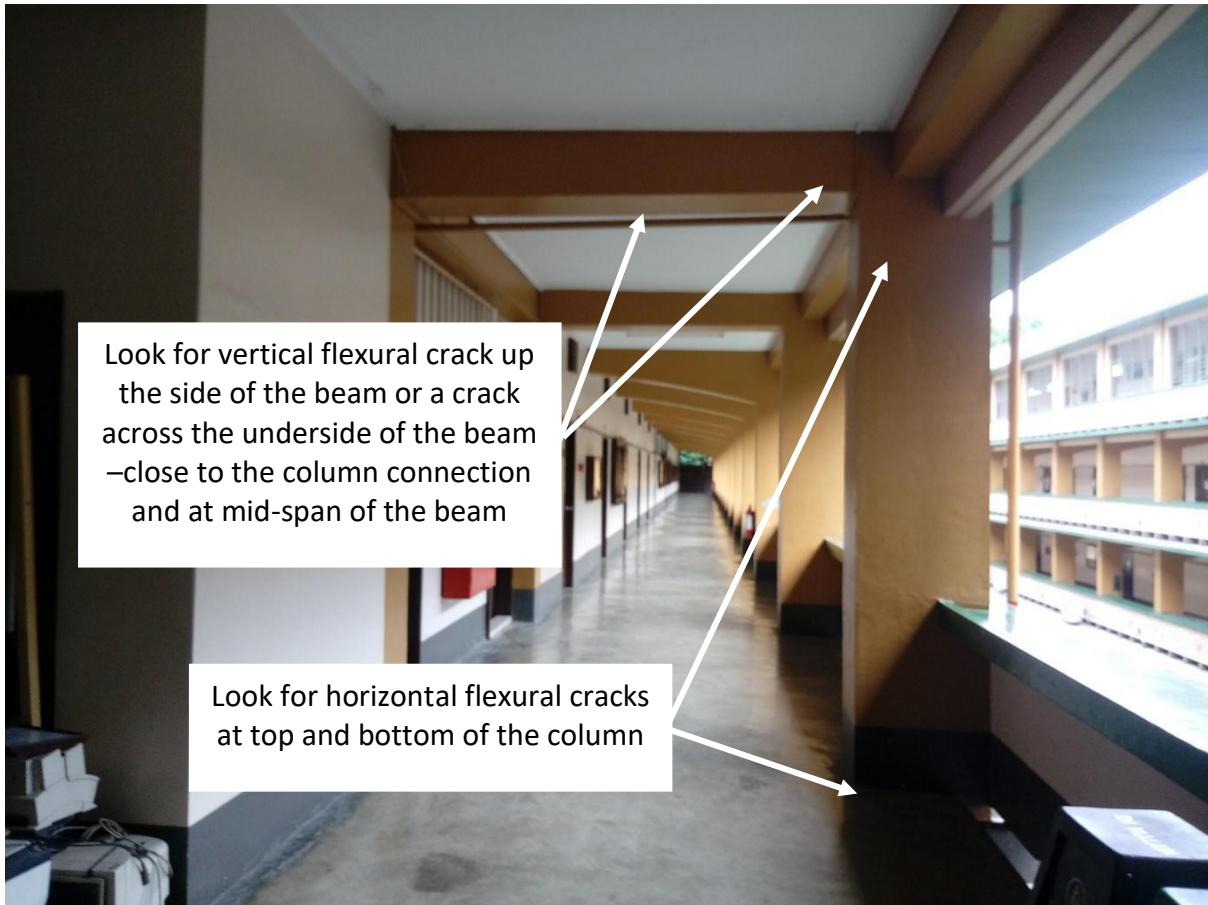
Typical in-situ concrete frame construction with full moment connections between columns and beams.
